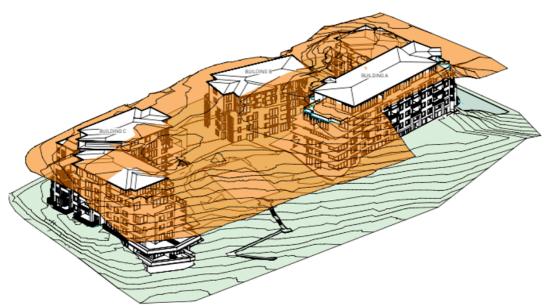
Height Plane Diagram – South East Elevation (extract from A 3.07 Rev E) Source: Giles Tribe
